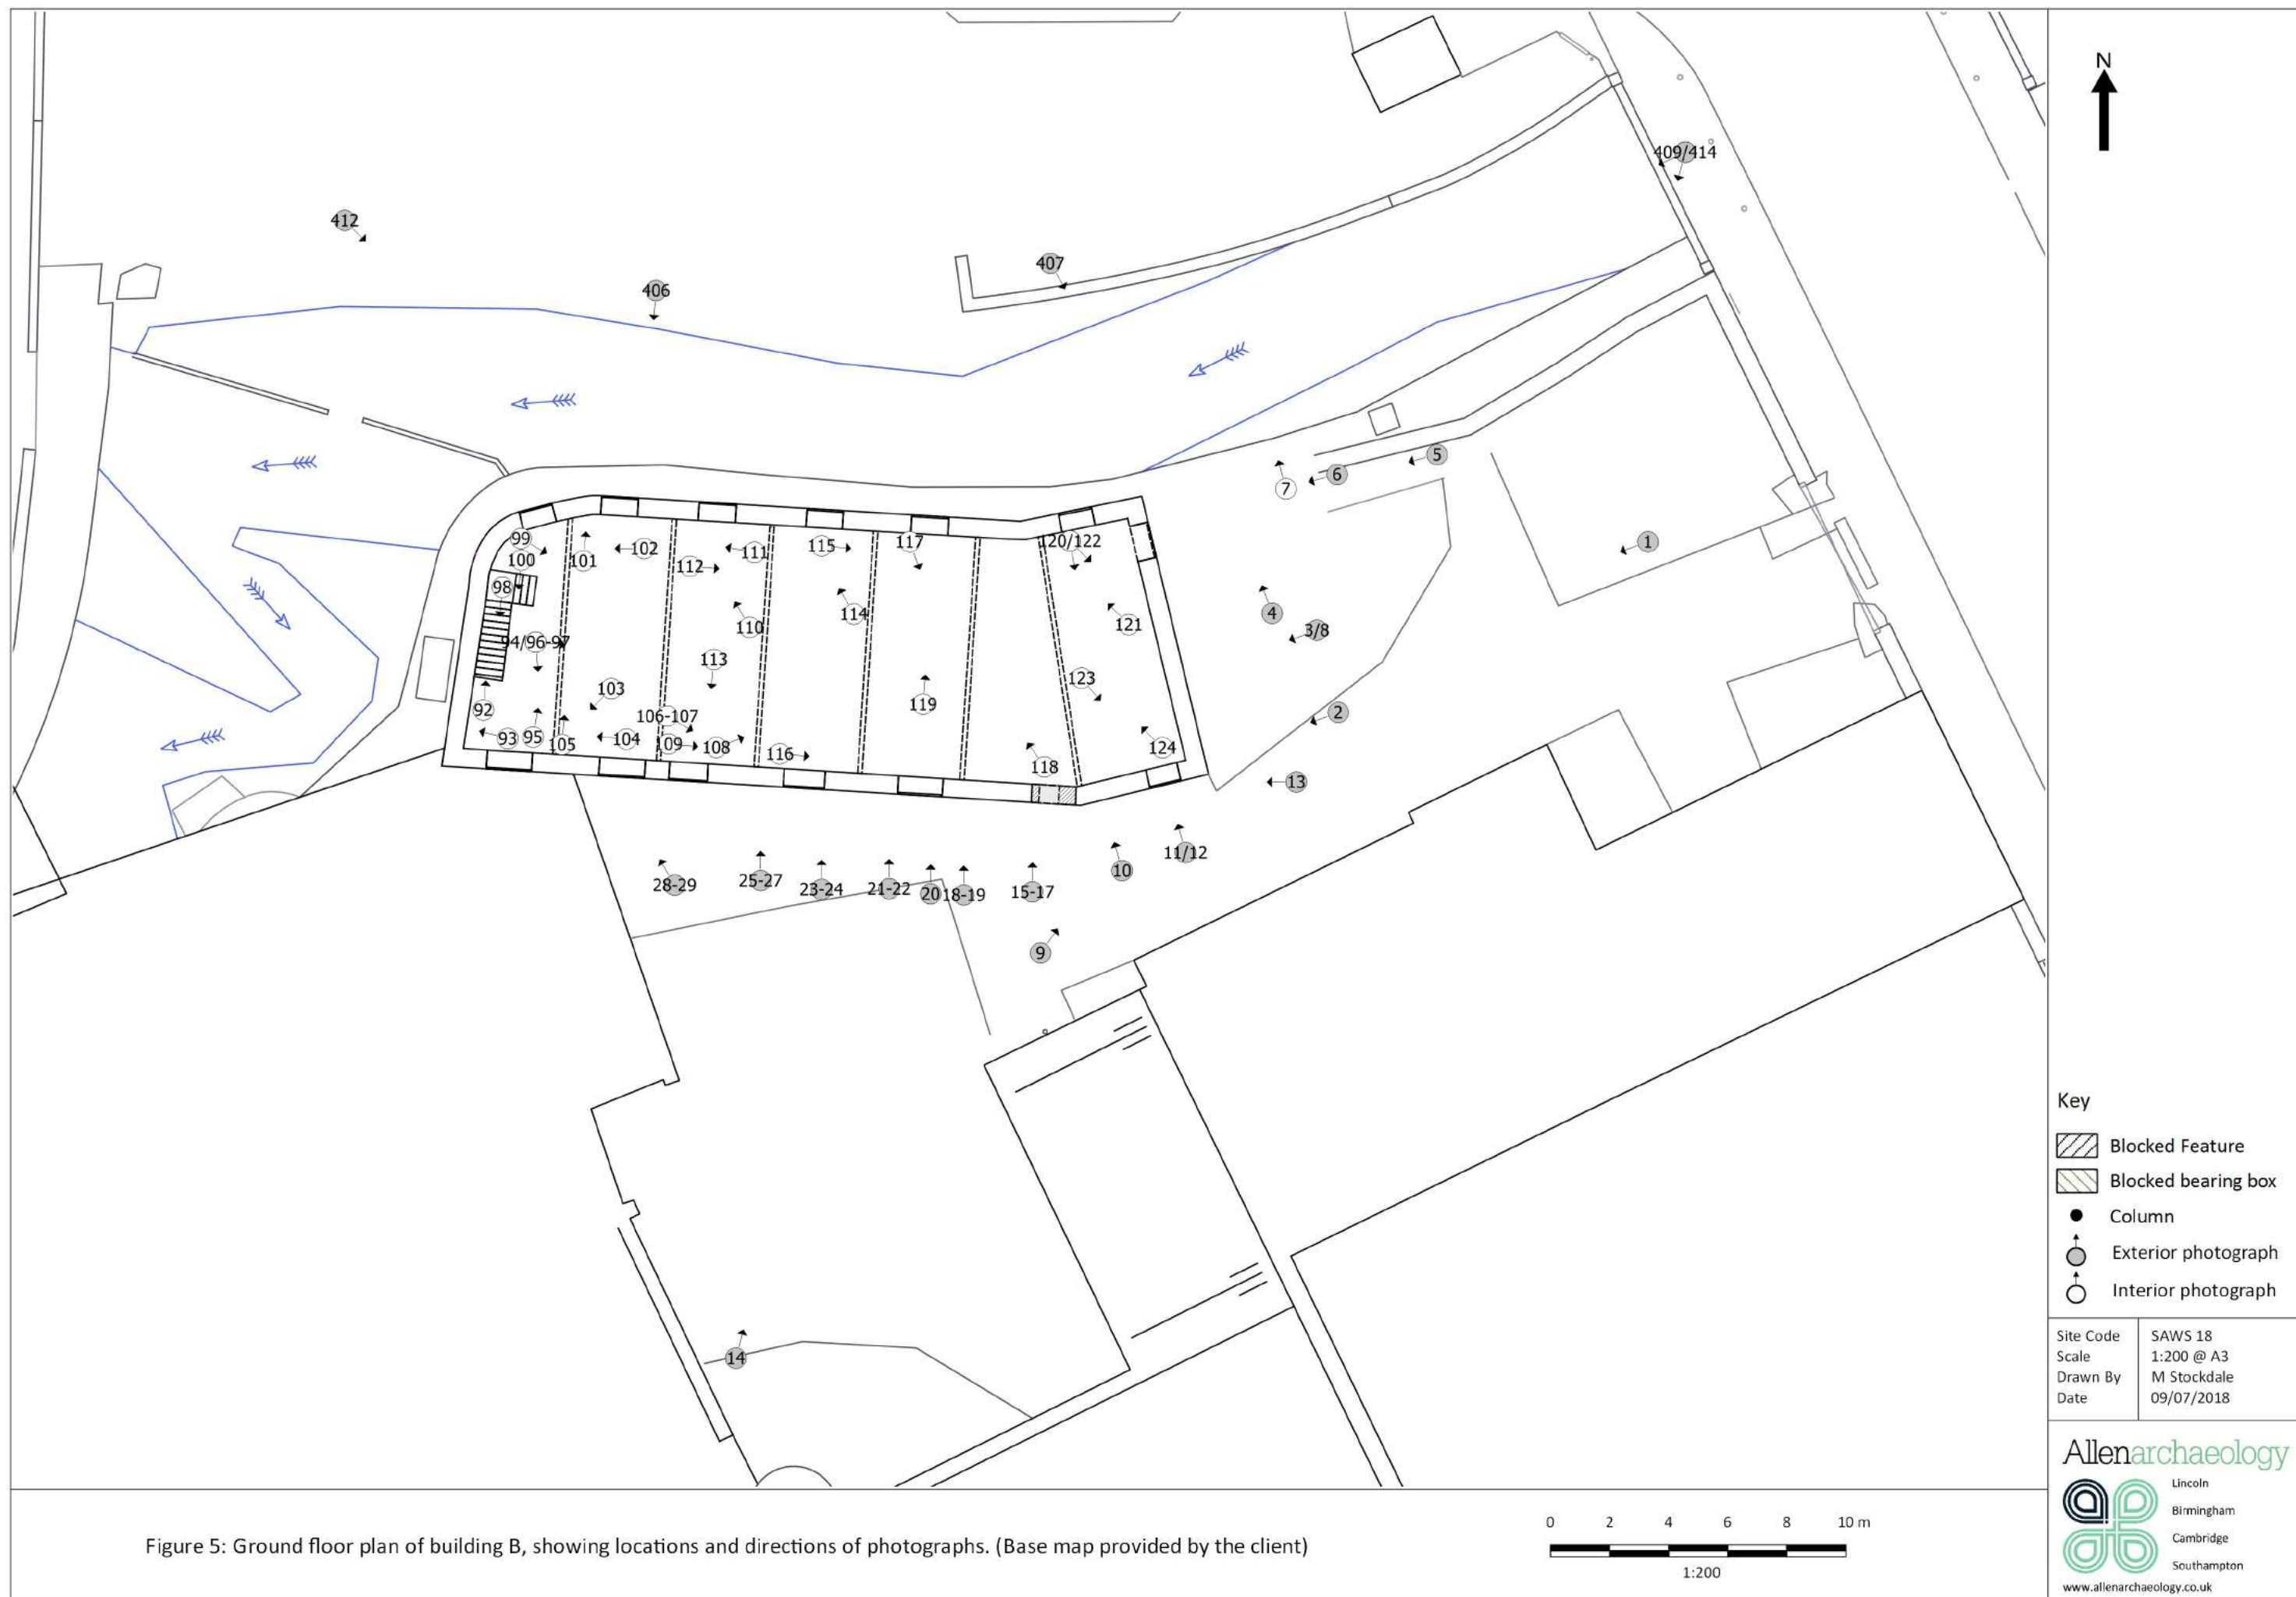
Ground floor plan of building B, showing locations and directions of photographs. (Base map provided by the client)
